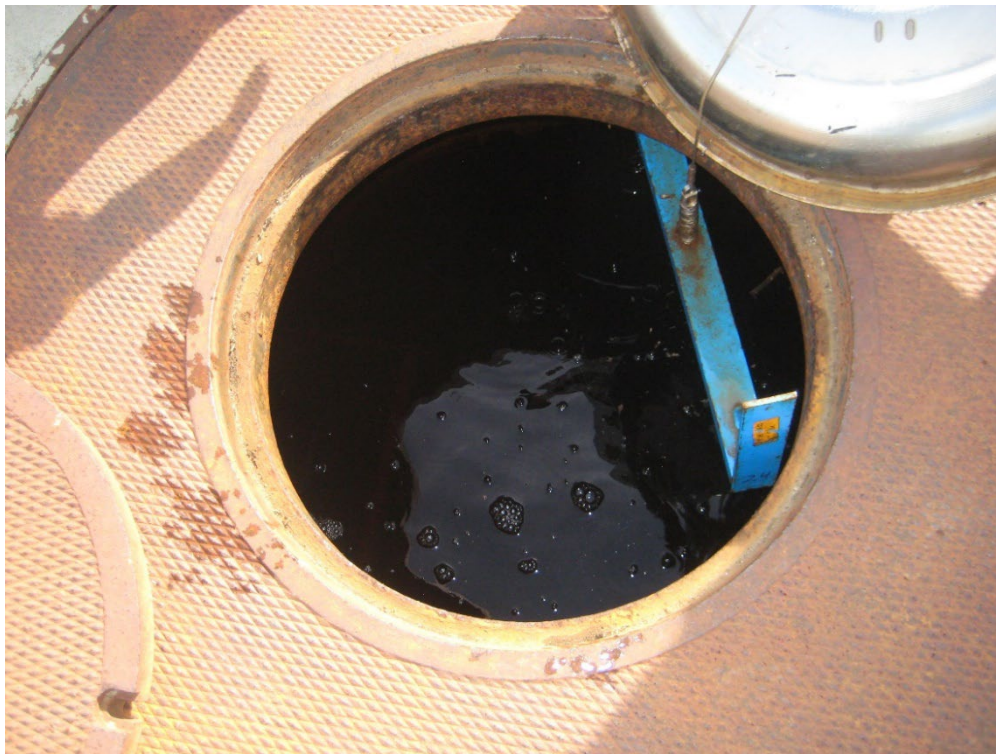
Auto Mall Parkway, Example of Manhole Submerged with Water Requiring Chemical Grout Injection
